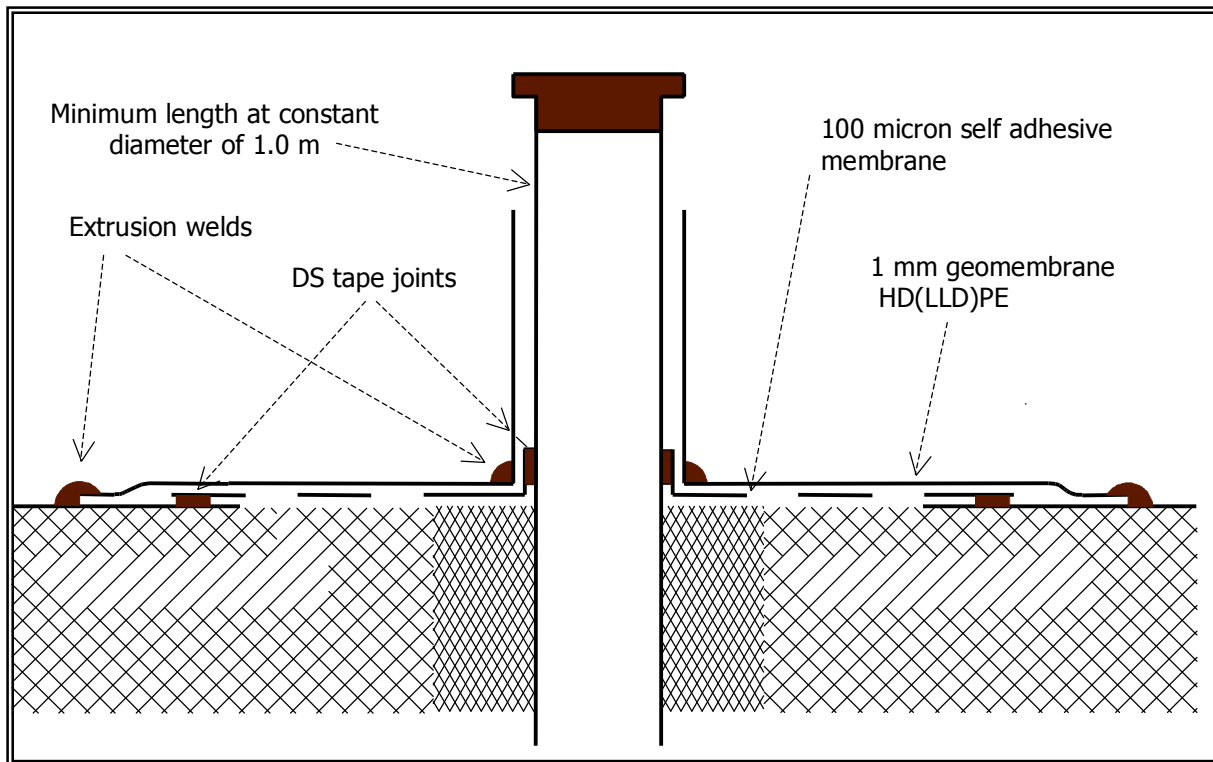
Plan view of gas extraction hose around a well during welding
